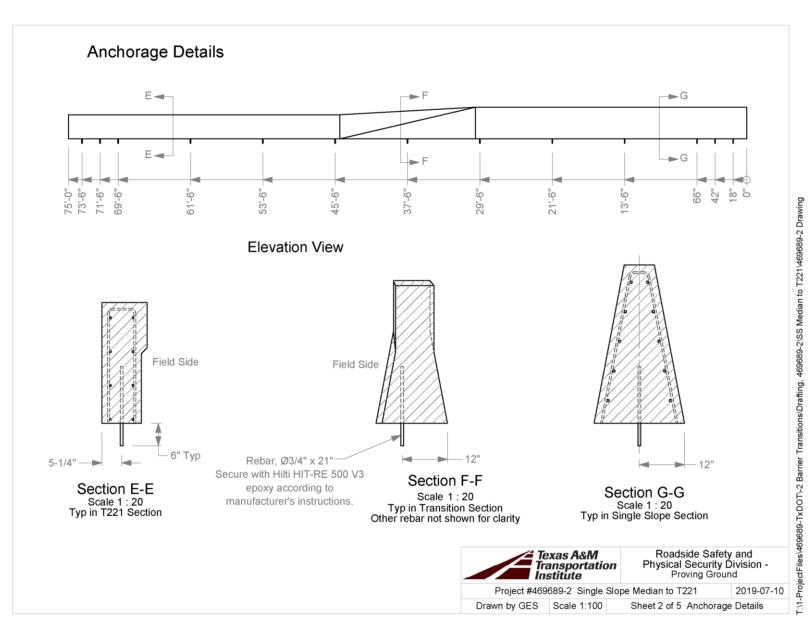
Anchor Details of T221 Vertical Wall to SSCB transition.
